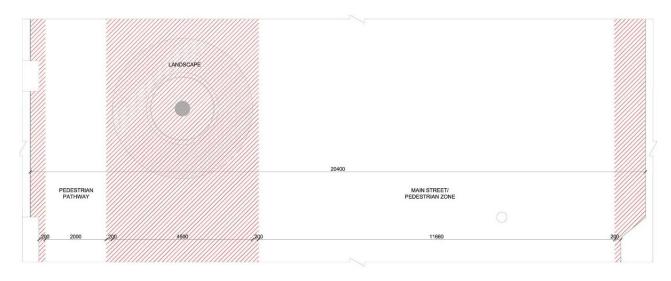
Street width and buffer spaces (in mm) for Gateway 4 in the area surrounding Luisenplatz in Darmstadt
